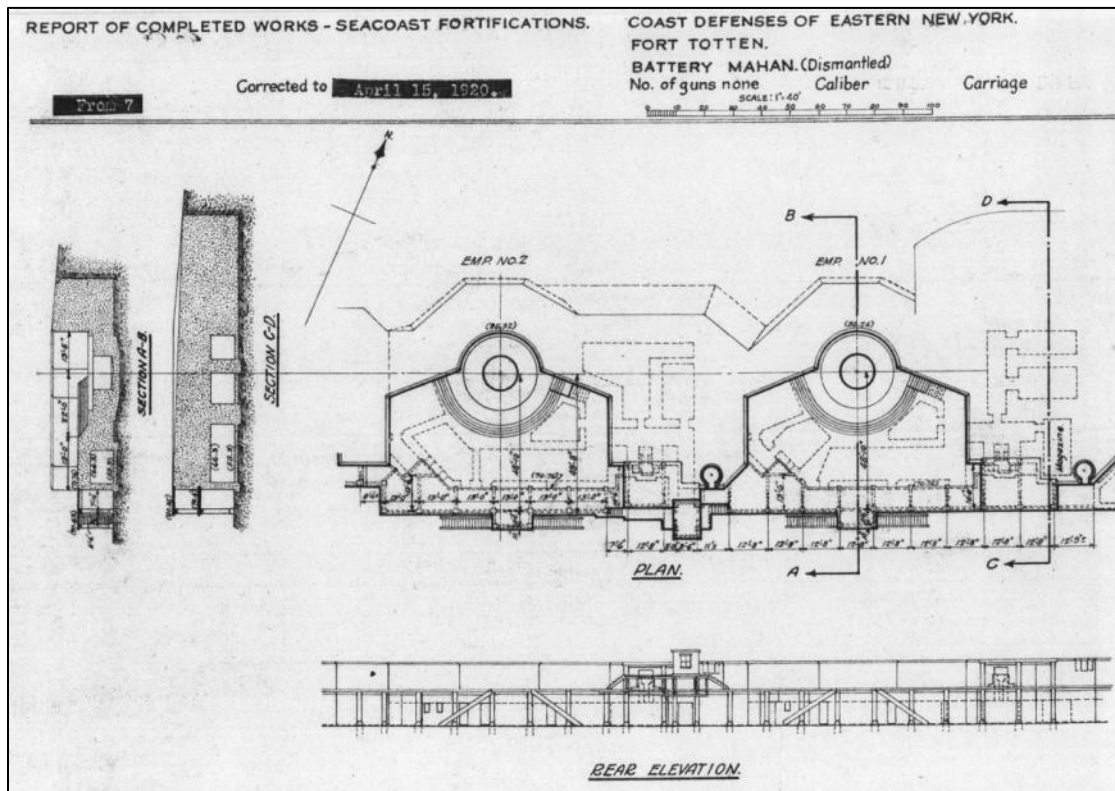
Plan, Elevation and Sections for Battery Mahan, Fort Totten, built 1898-1900 (NARA, 1920, Report of Completed Works)
